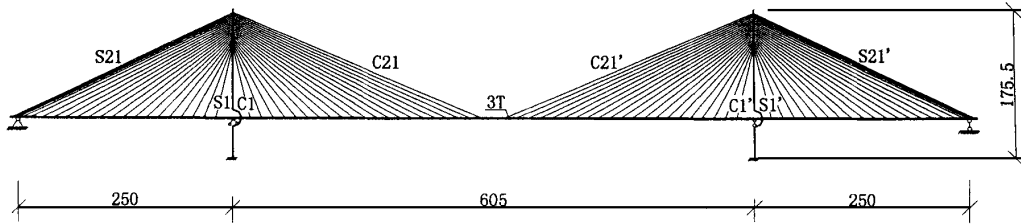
Elevation of Qingzhou Bridge (Unit: m).
